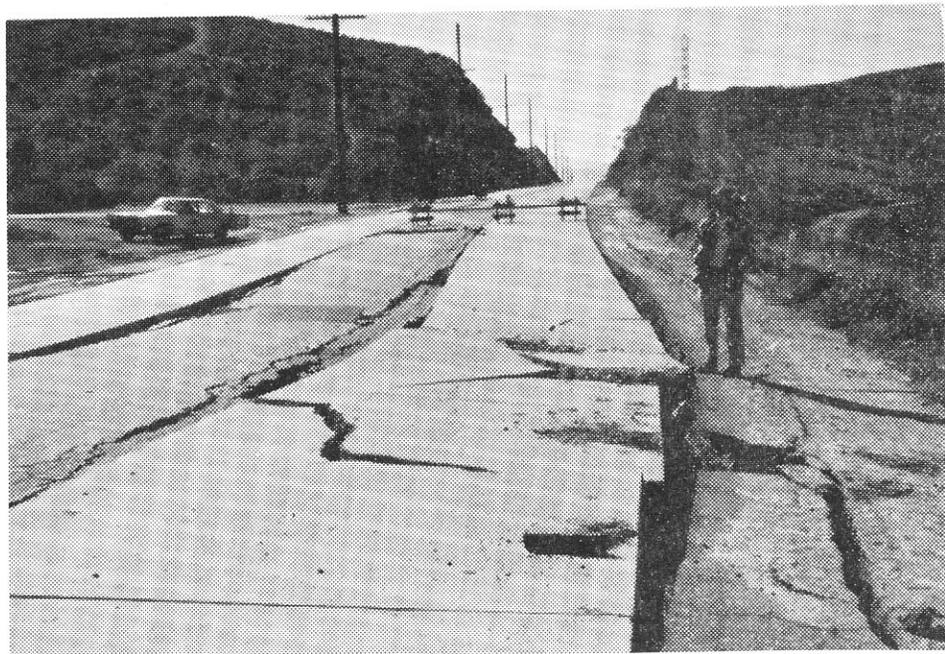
Looking southerly along Blucher Avenue at results of fill movement to the west.
